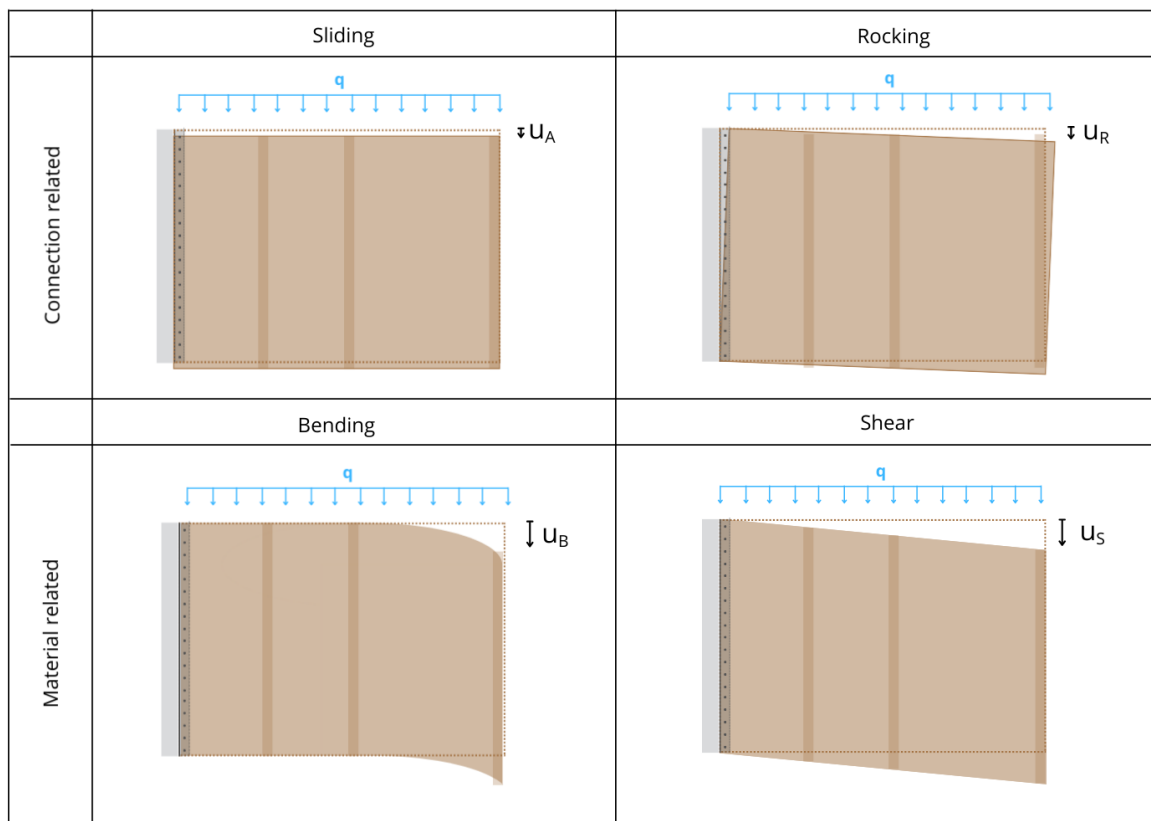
Deformation components of the cantilevering segment for a monolithic floor: sliding, rocking, bending and shear.
